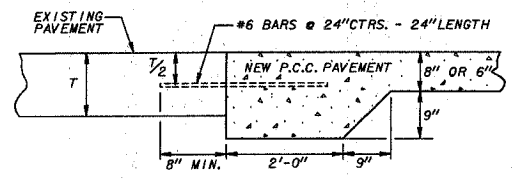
DETAIL OF REINFORCEMENT FOR PCC PAVEMENT FROM STA. 17+08 TO STA. 35+50
